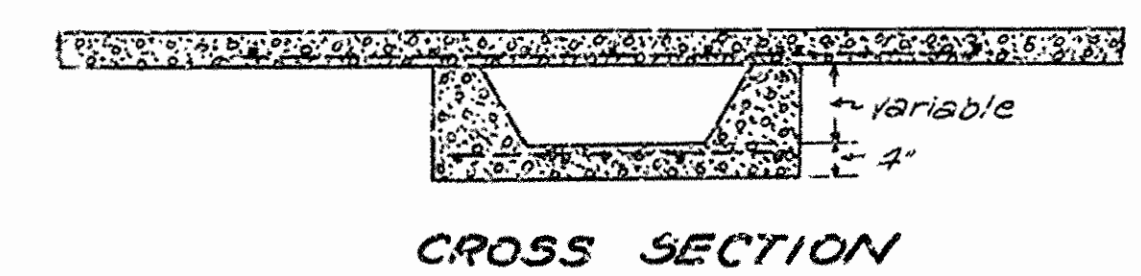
DETAIL OF CONCRETE RETAINING WALL TO BE CONSTRUCTED ON LEFT STA. 3+48 - STA. 3+78 STA. 4+00 - STA. 4+15 (WEST WYE)
